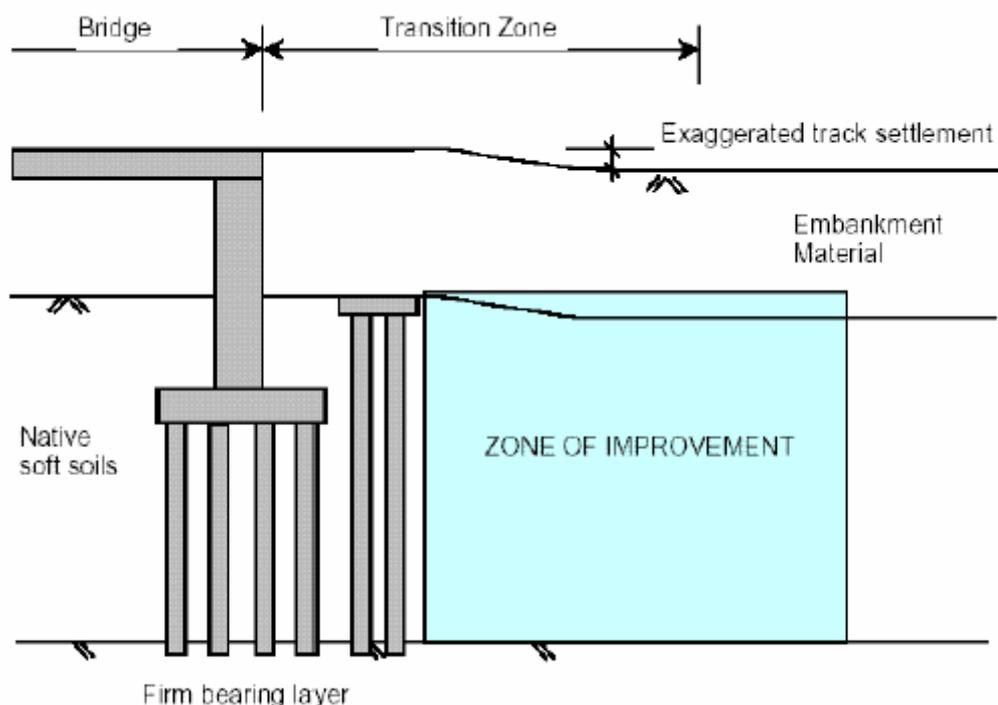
Principle sketch of zone of improvement at deep foundation of bridge abutment
